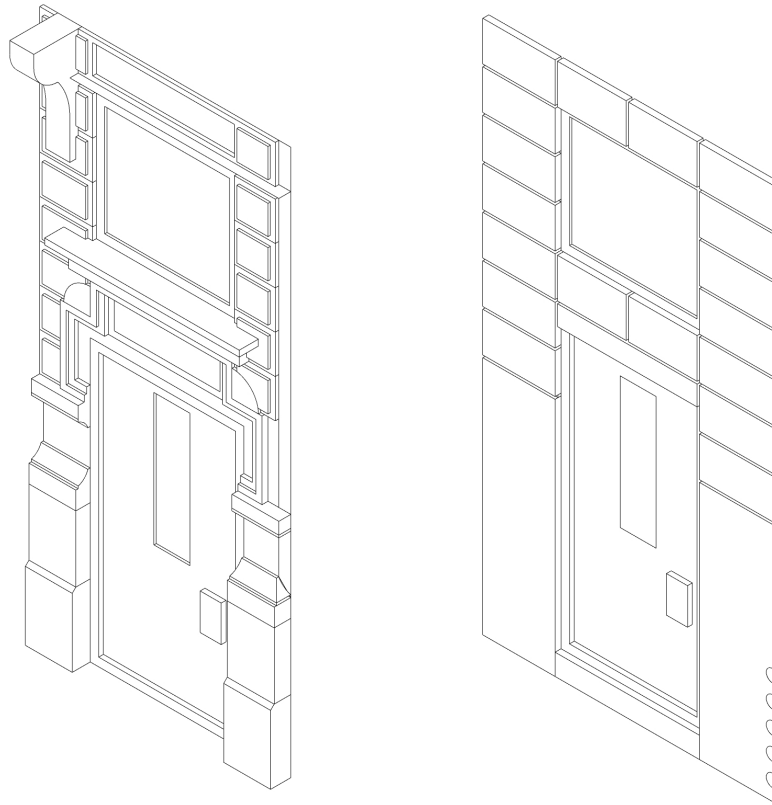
, front doors of the existing houses (left) and new building (right) of Pension van Schoonhoven (own work)
